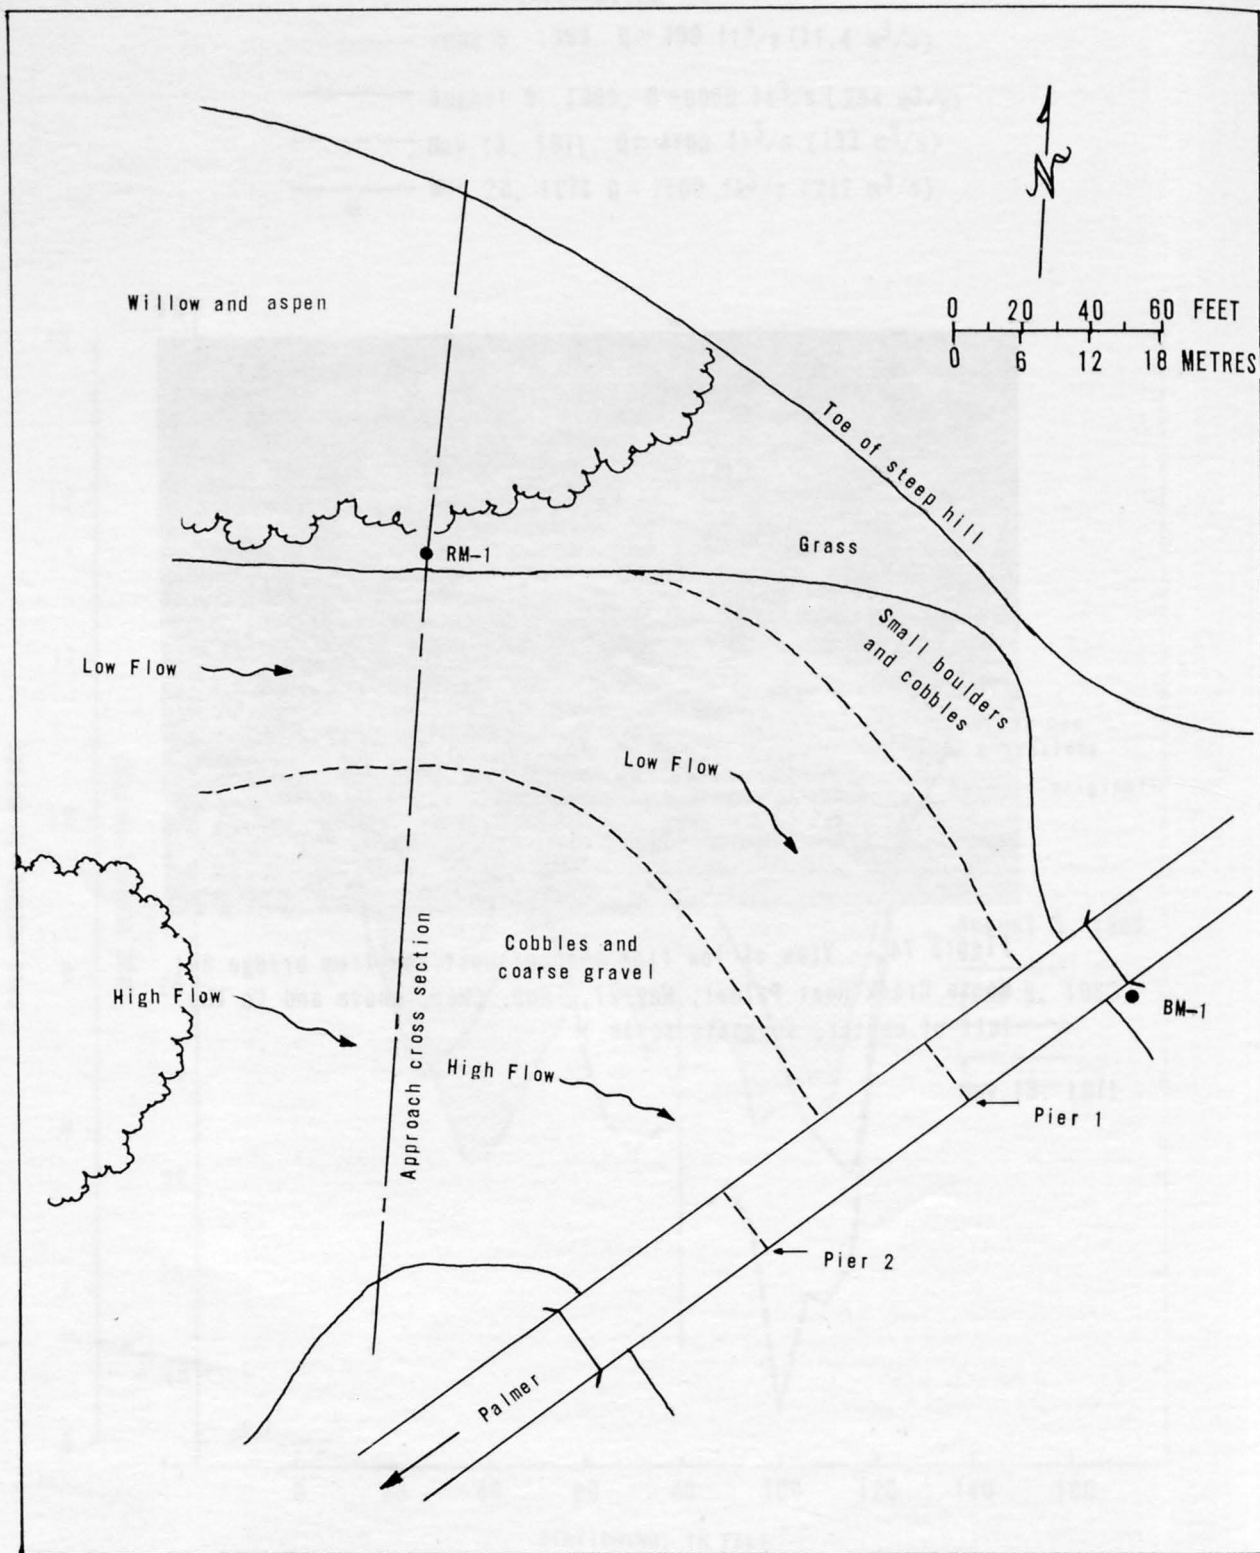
Plan view of Moose Creek near Palmer, bridge 541.
